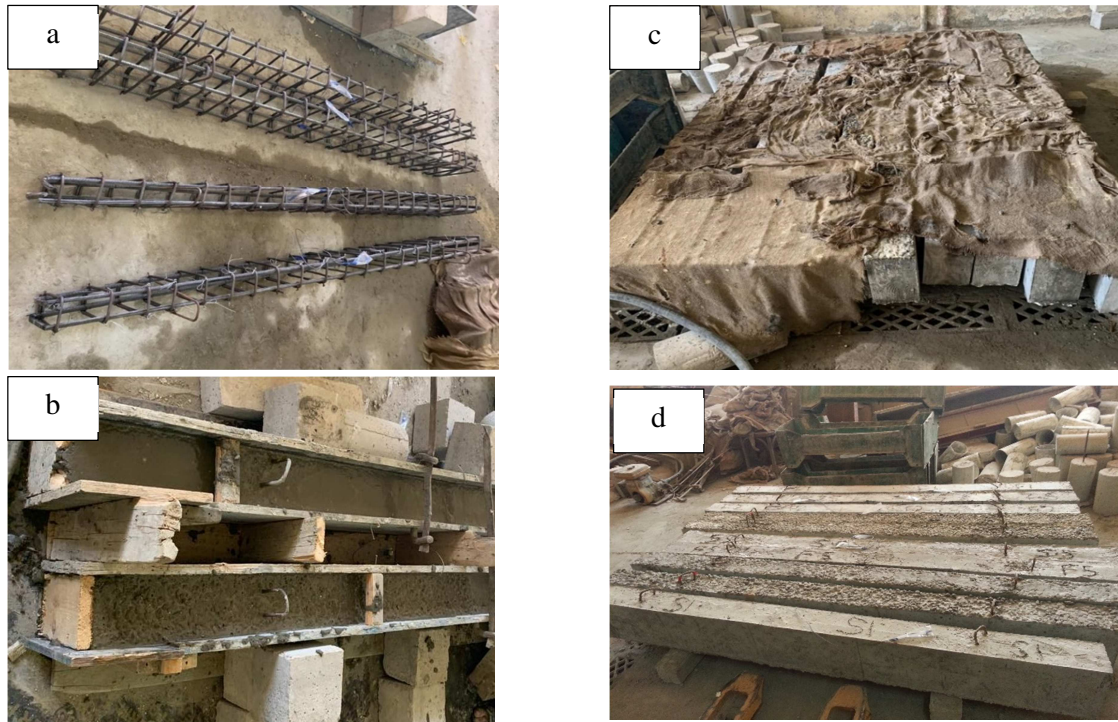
Specimen fabrication steps (a) Reinforcement preparation (b) Casting of beams (c) Curing of beams (d) Beams before testing
